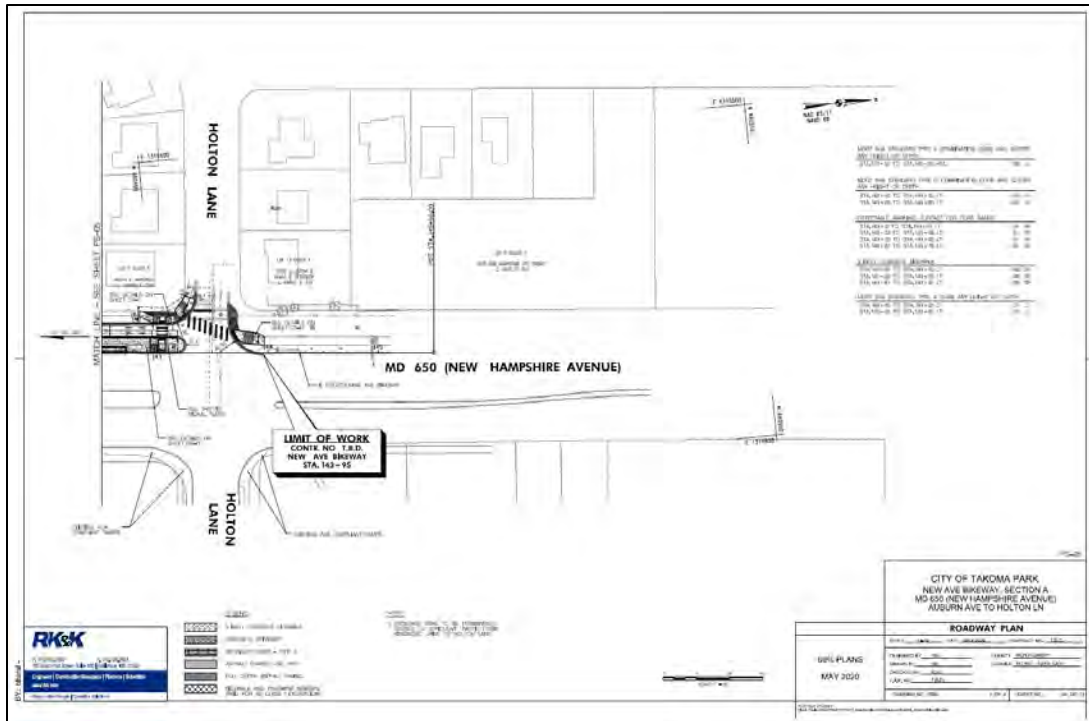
Plan View of Proposed New Avenue Section A Improvements (Part 6)
